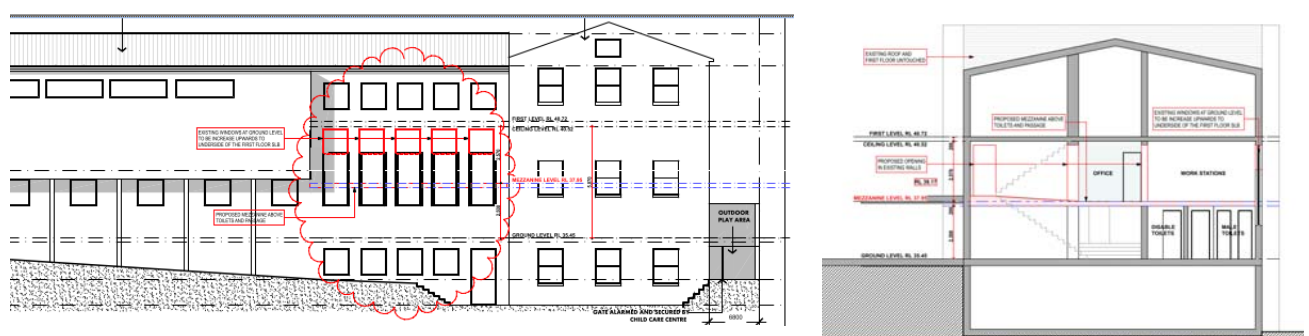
Elevation and section of mezzanine level at 67 Norton Street.
